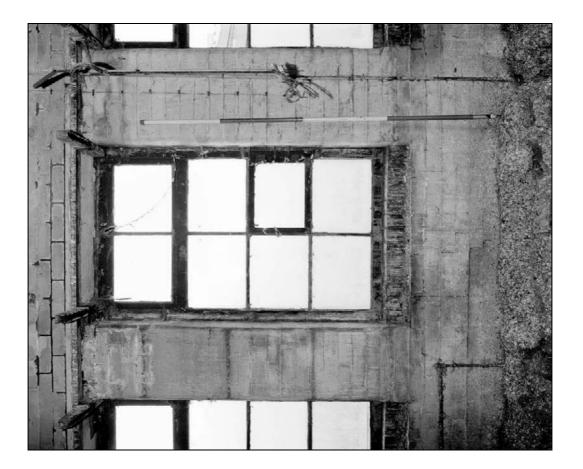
Detail of doorway from S3 to S4, east wall of S3 (film 41.28)
